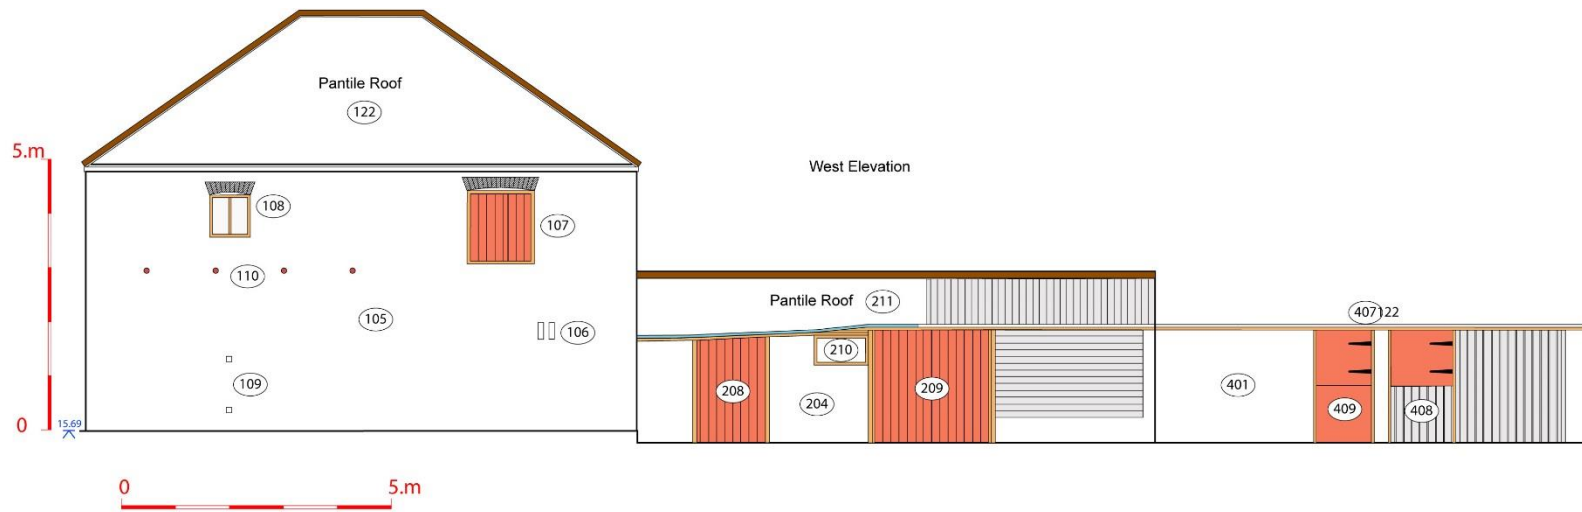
West elevation of the combination Barn, Multi Bay Multi Bay Shelter Shed and Loose Boxes.
